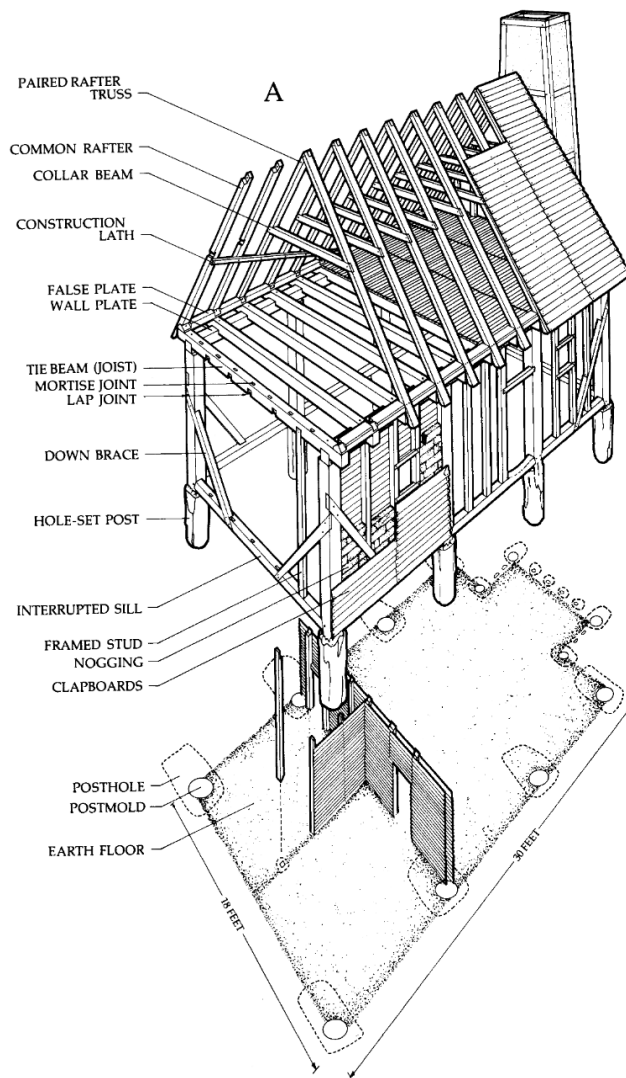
A reconstruction of the timber frame house described in the 1684 instruction manual with the addition of a chimney design based on archaeological evidence (Carson, Barka, Kelso, Stone, & Upton 1981, 142).
